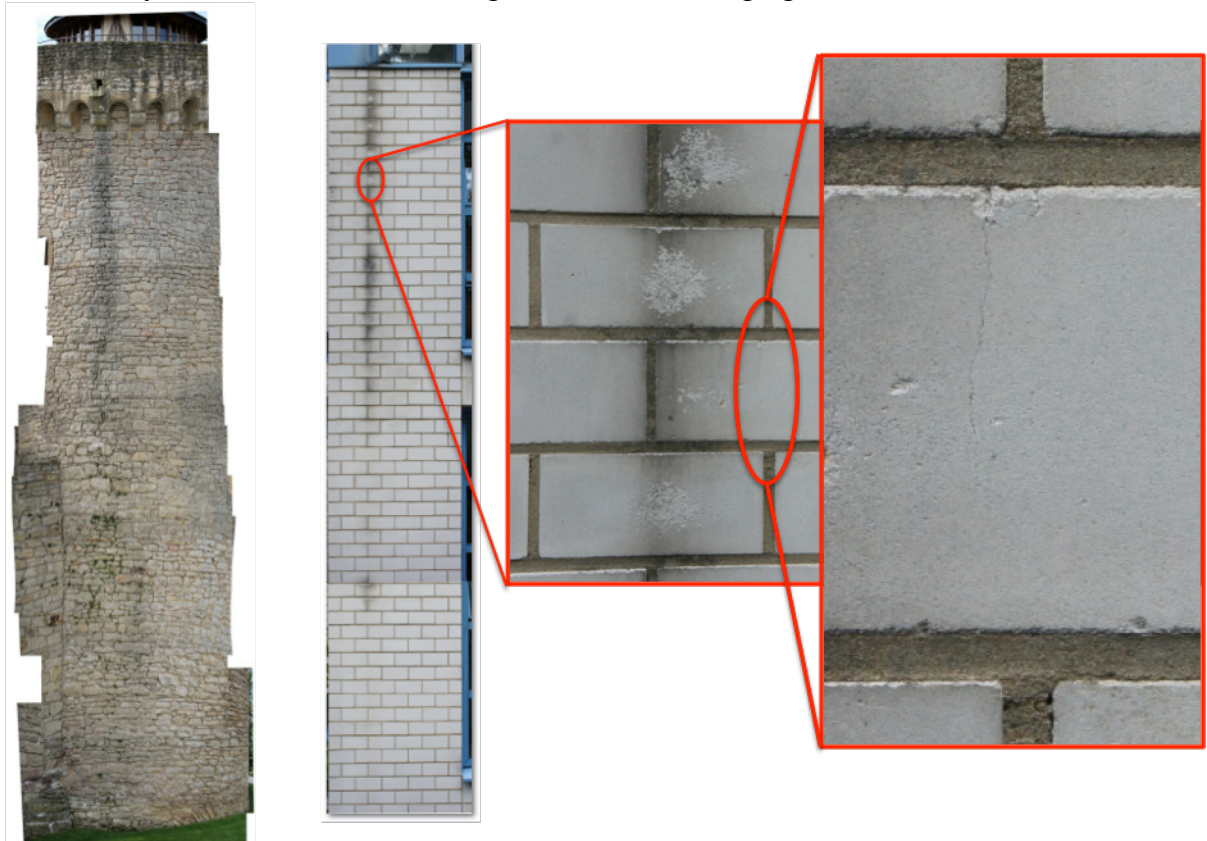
Different results and resolution from stitched images: historic tower (left) and multi storey brick walled building (right)
